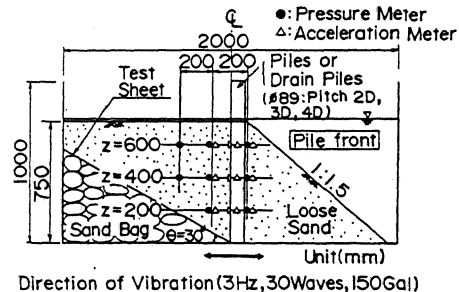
Shaking Table Test for Preventing Deformation of Embankment By Piles
